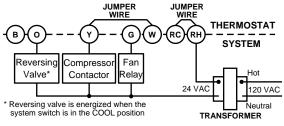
Typical wiring diagram for heat pump with cool active reversing valve
